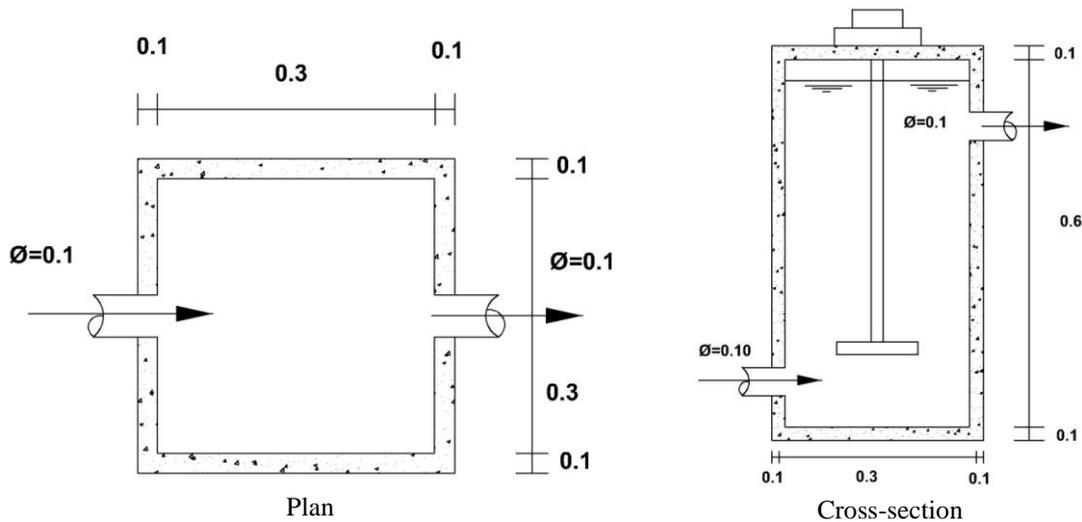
Plan and Cross-section of designed Flash Mixer (dimensions in m, not up to the scale)
